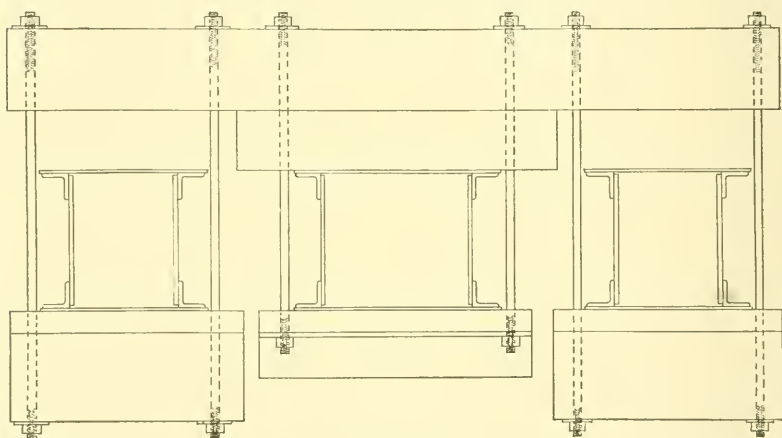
METHOD OF TEMPORARILY SUPPORTING TOP CHORDS OF ORIGINAL TRUSSES UPON TOP CHORD OF RAILWAY TRUSS.
